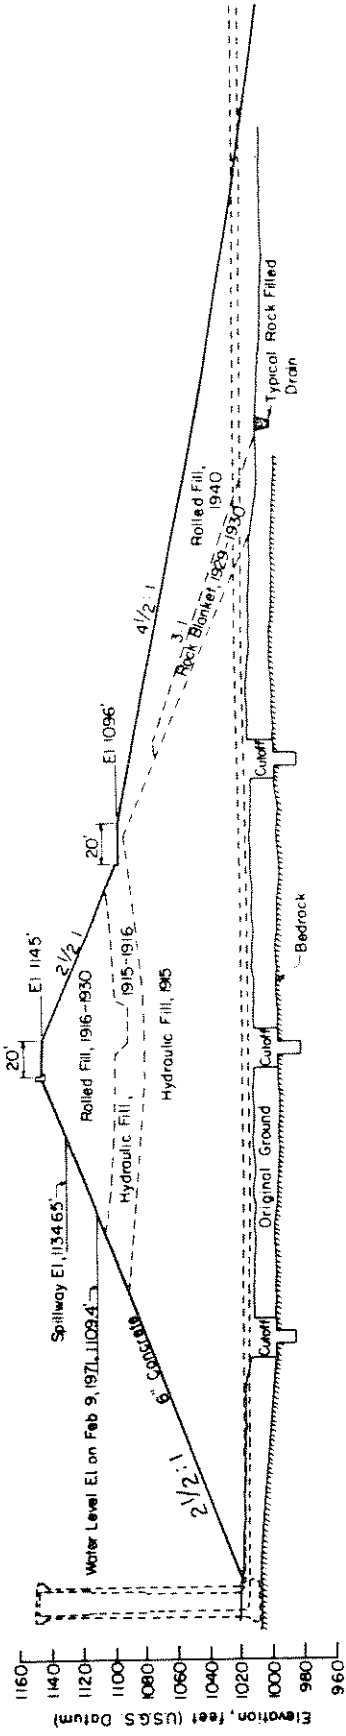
CROSS-SECTION THROUGH LOWER SAN FERNANDO DAM.
